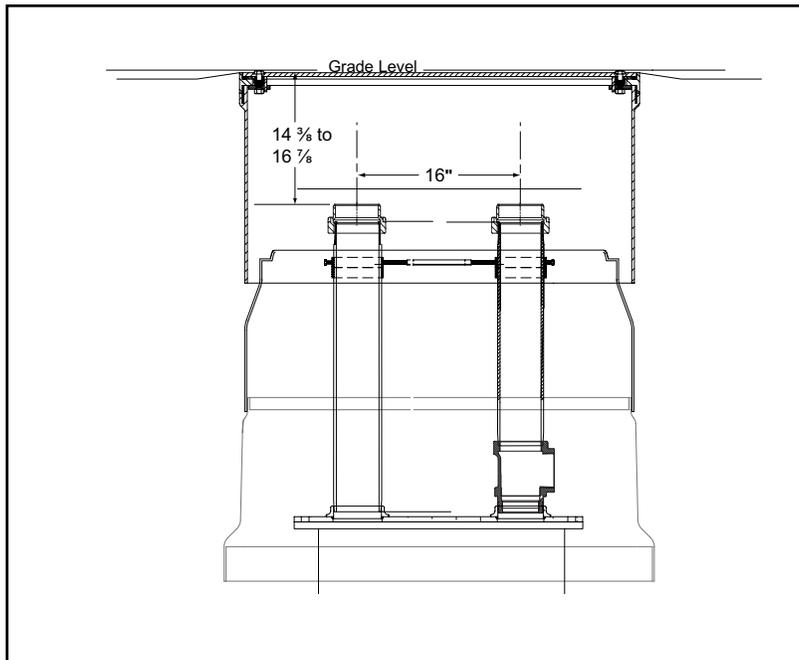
Installation Using M/F 4x4 Riser Adapters NPSM (Straight Thread) Buckets
